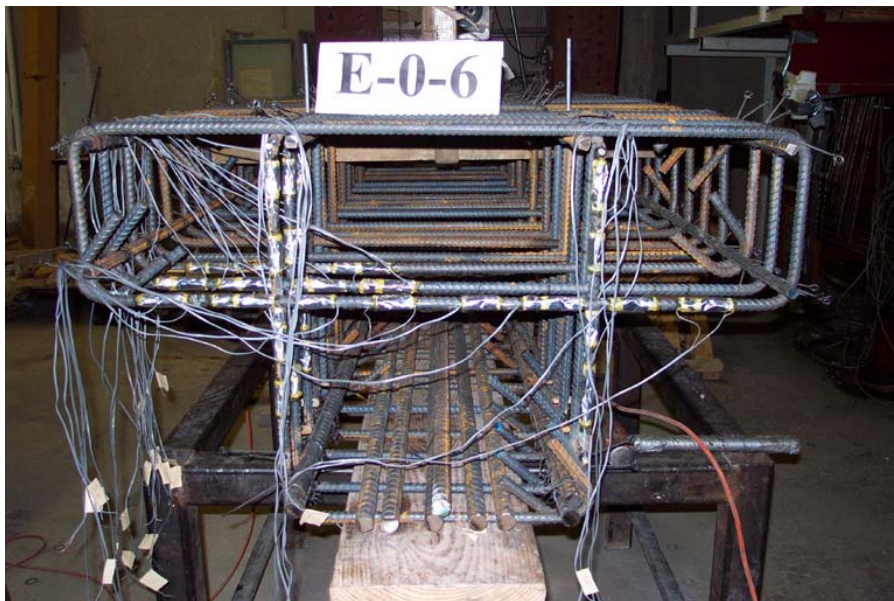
(c) Steel cage without diagonal bars (Specimen E-0-6)
